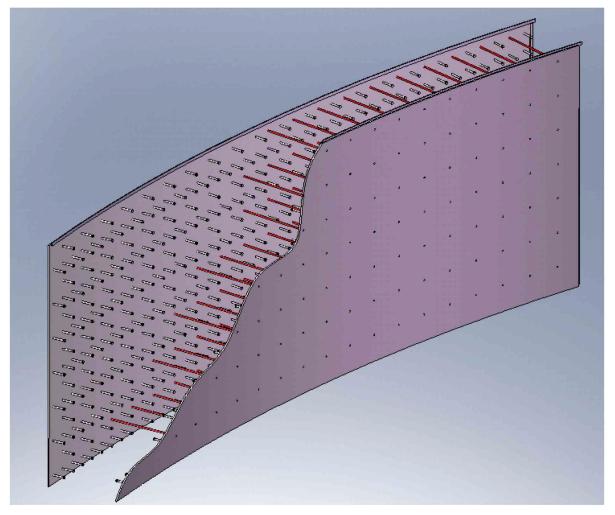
H.5-13 Enhanced Shield Building Wall Panel Layout
